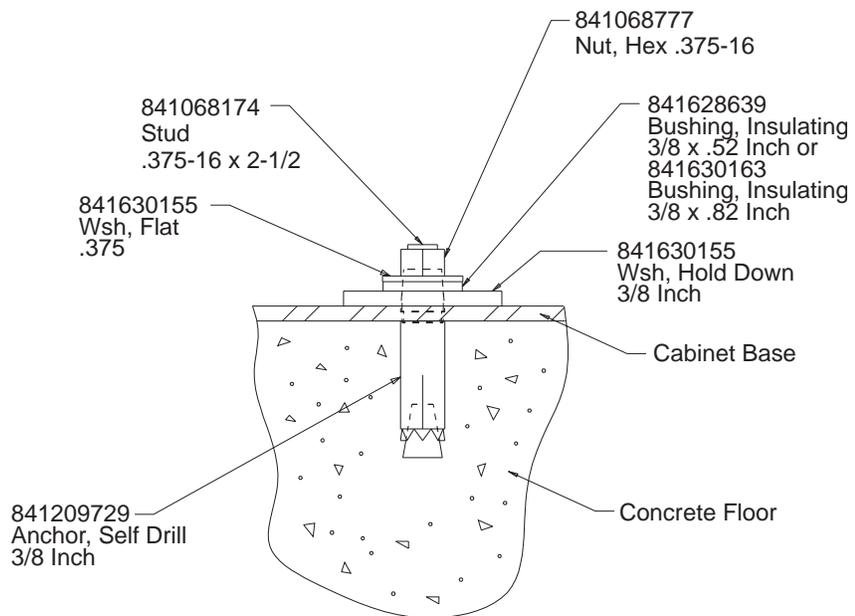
H569-407 Group 10 Floor Mounting Detail
